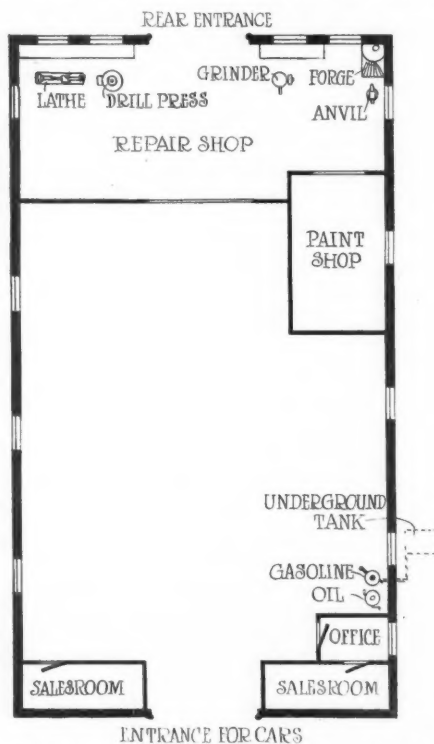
A city garage floor plan showing the location of the various departments and the repair shop installations. This is a general plan with a view to giving arrangement suggestions
